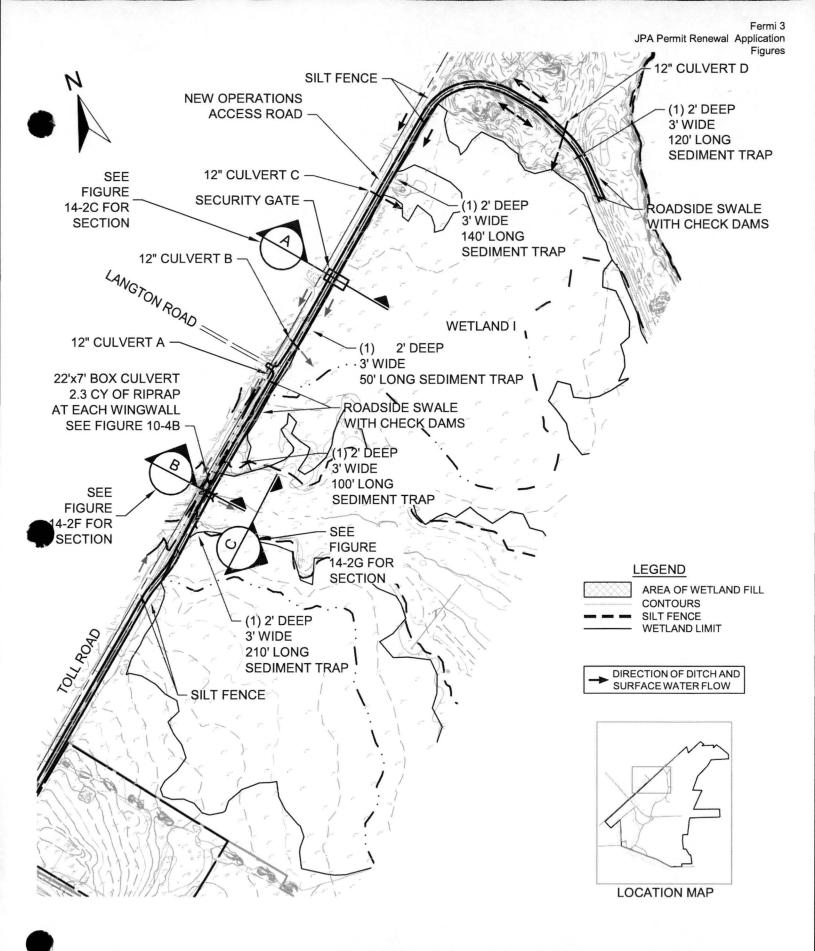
A NEW OPERATIONS ACCESS ROAD PLAN VIEW
